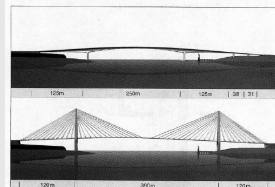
View of the free cantilever-bridge (adopted design) and of the cable-stayed bridge (alternative proposal)
